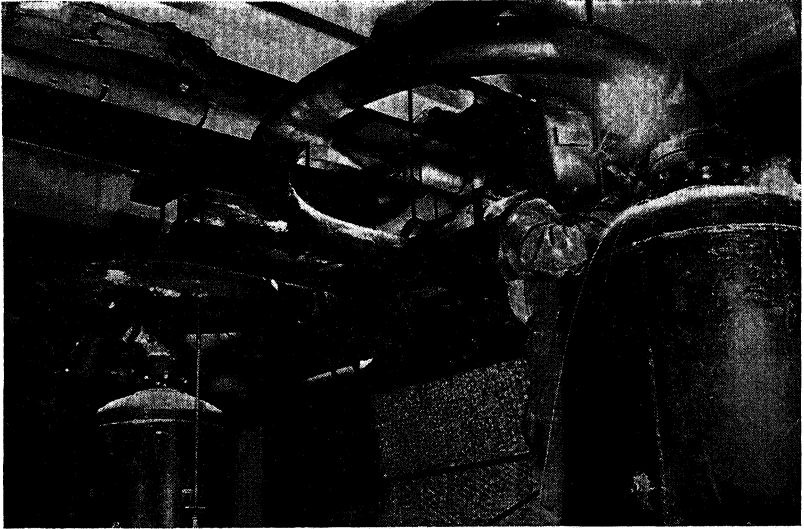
Part of arc welded piping system in an apartment house. Total length of piping 6,000 ft. varying from 2-in. to 12-in. Working pressure of steam line is 185 lbs. Contractor saved three to four times the price of his welding machine over any other method of welding or fabrication.
